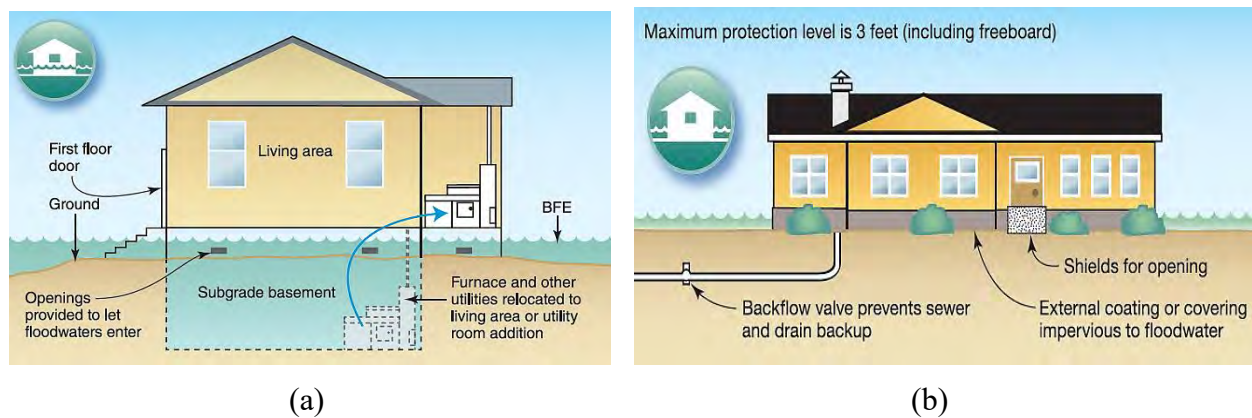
Schematic of wet/dry floodproofing strategy (FEMA P-312): (a) home with subgrade basement using wet floodproofing; (b) typical details for dry floodproofing techniques.
